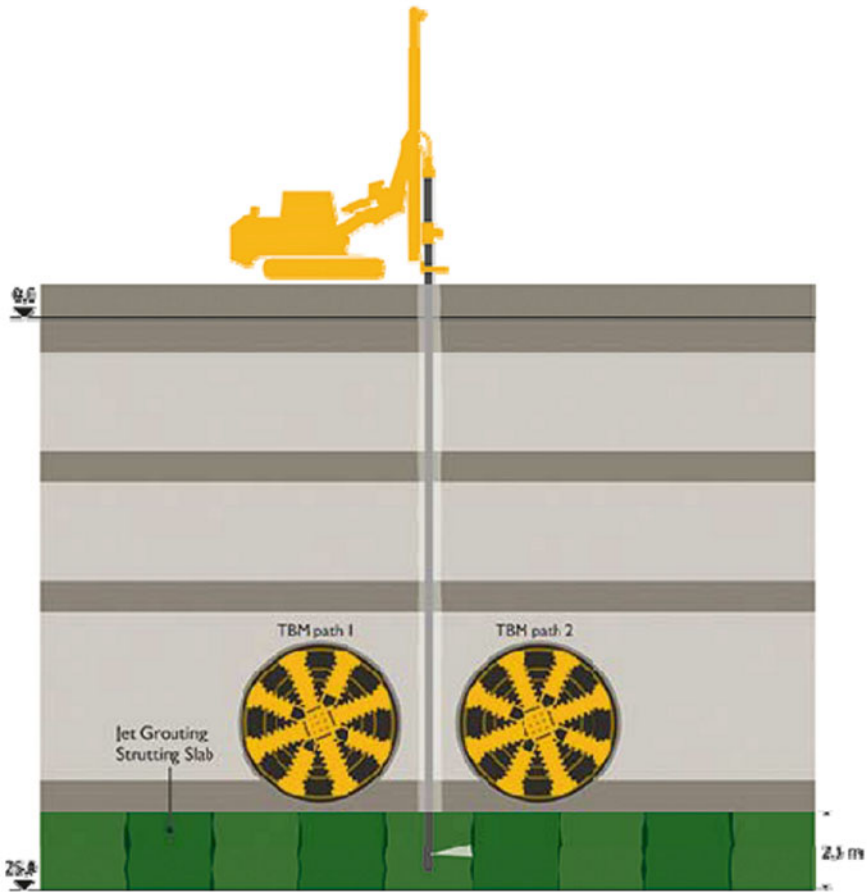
Cross section of jet grouted strutting slab beneath the foundation of the metro station
